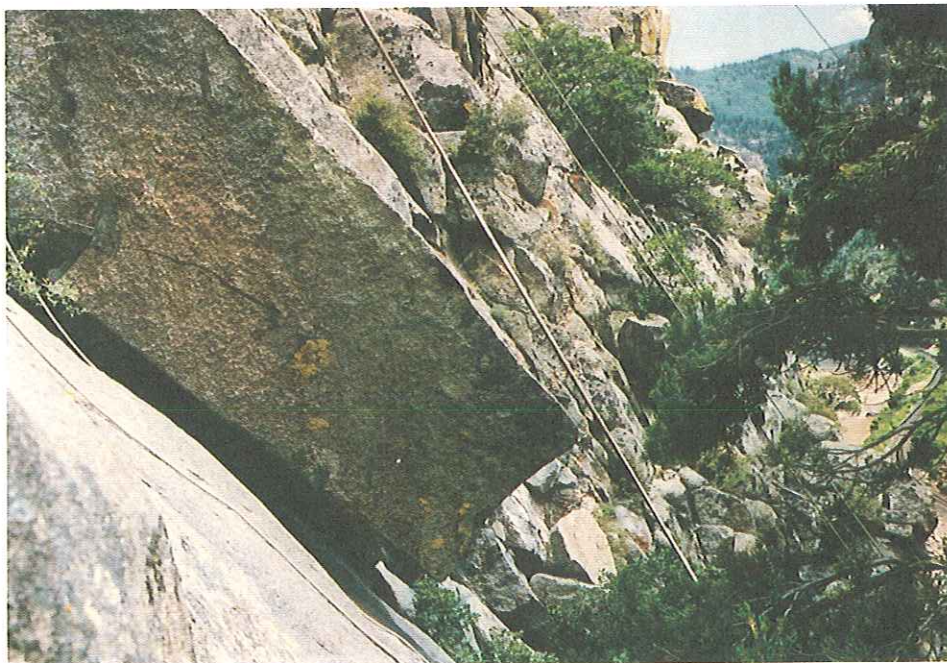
Unstable slab resting on a 45° dip slope. The site is about 300 feet (91.5 meters) above the Glenwood Canyon highway (*Courtesy Colorado Department of Transportation*).
